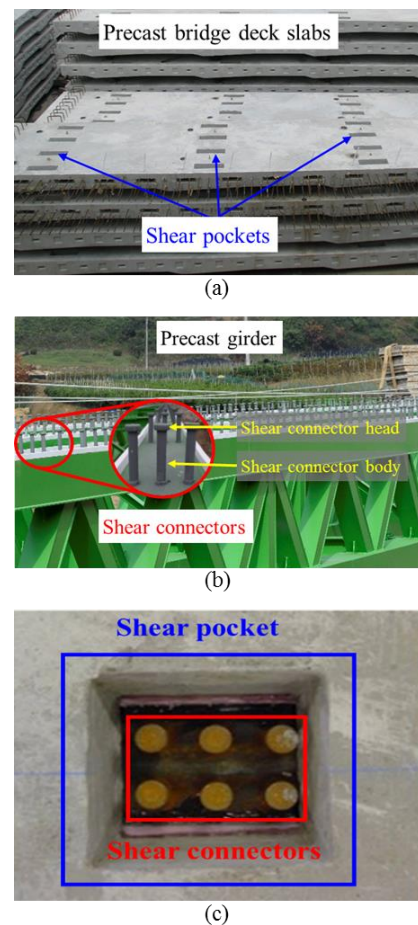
Coupling between shear pockets and shear connectors. (a) Precast bridge deck slabs
